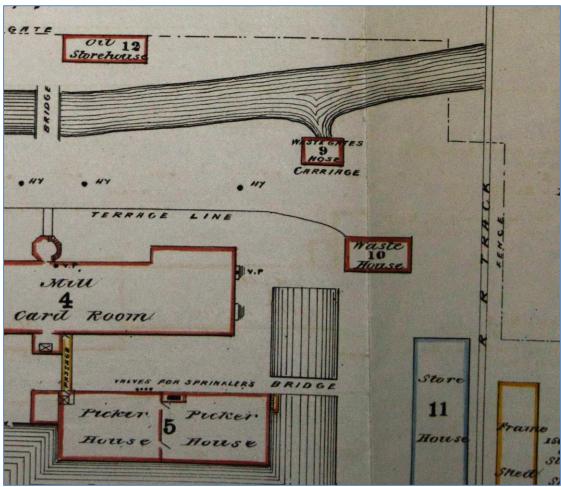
Plan of Nashua Manufacturing Co. in 1875 (map oriented north down), showing earlier Waste House built in 1869 (Source: Barlow's Insurance Surveys).
